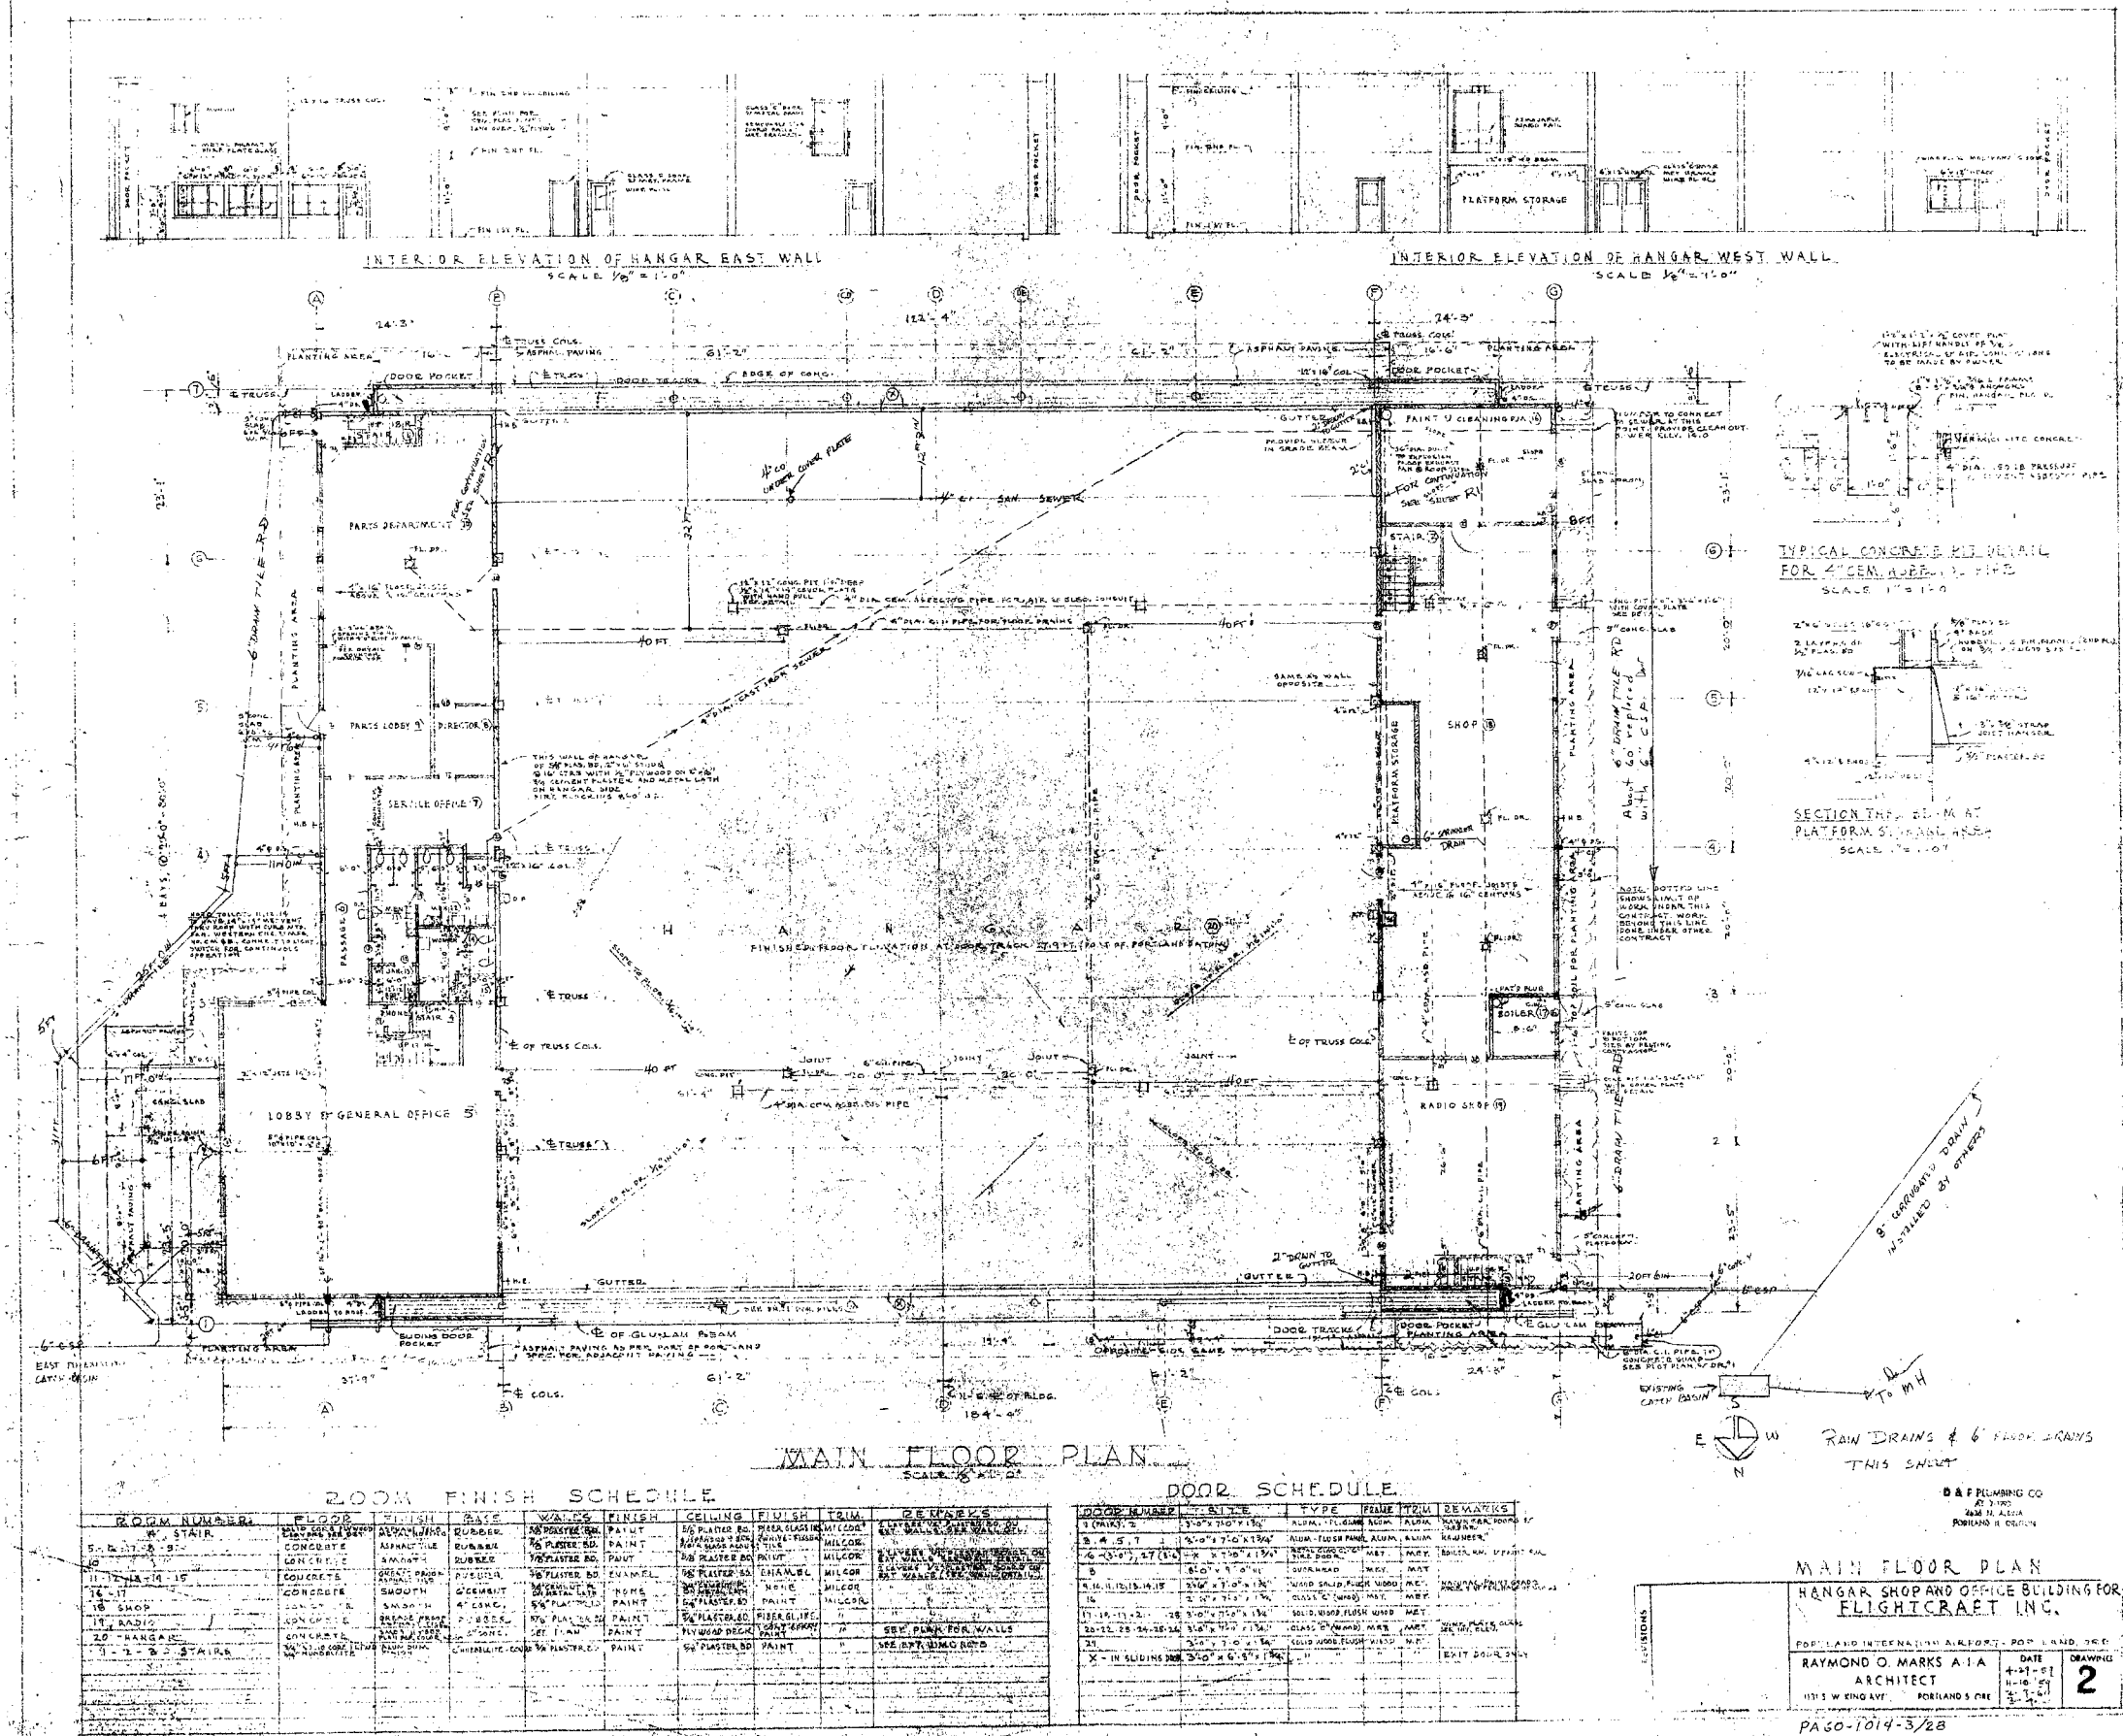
Flightcraft "A" Hangar First Floor Plan.
